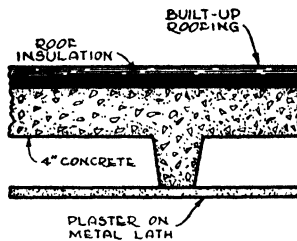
Section through 4-inch Concrete Roof with Metal Lath and Plaster Ceiling (See Example 2)
